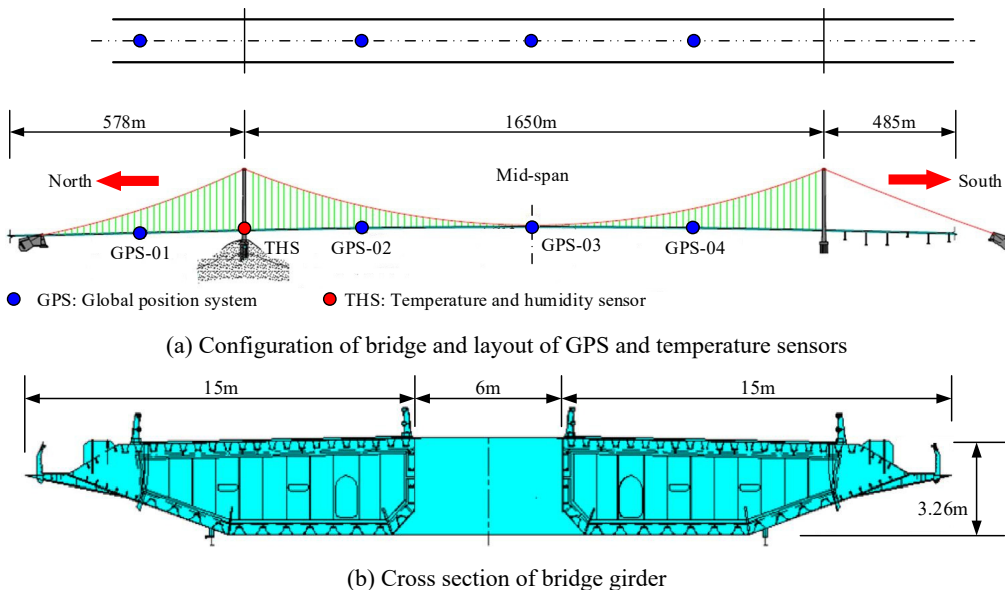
Site plan and sensor layouts of the Xihoumen Bridge
